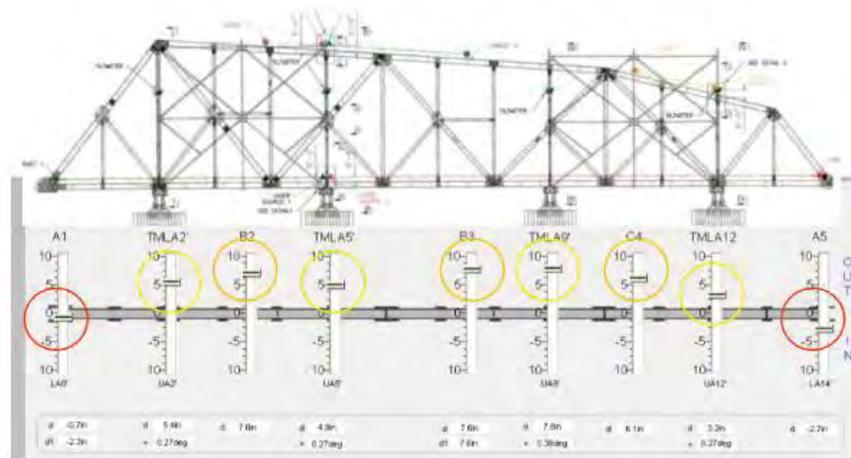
Twin Screen Display Showing Plan View of Truss Distortion and Tilt
